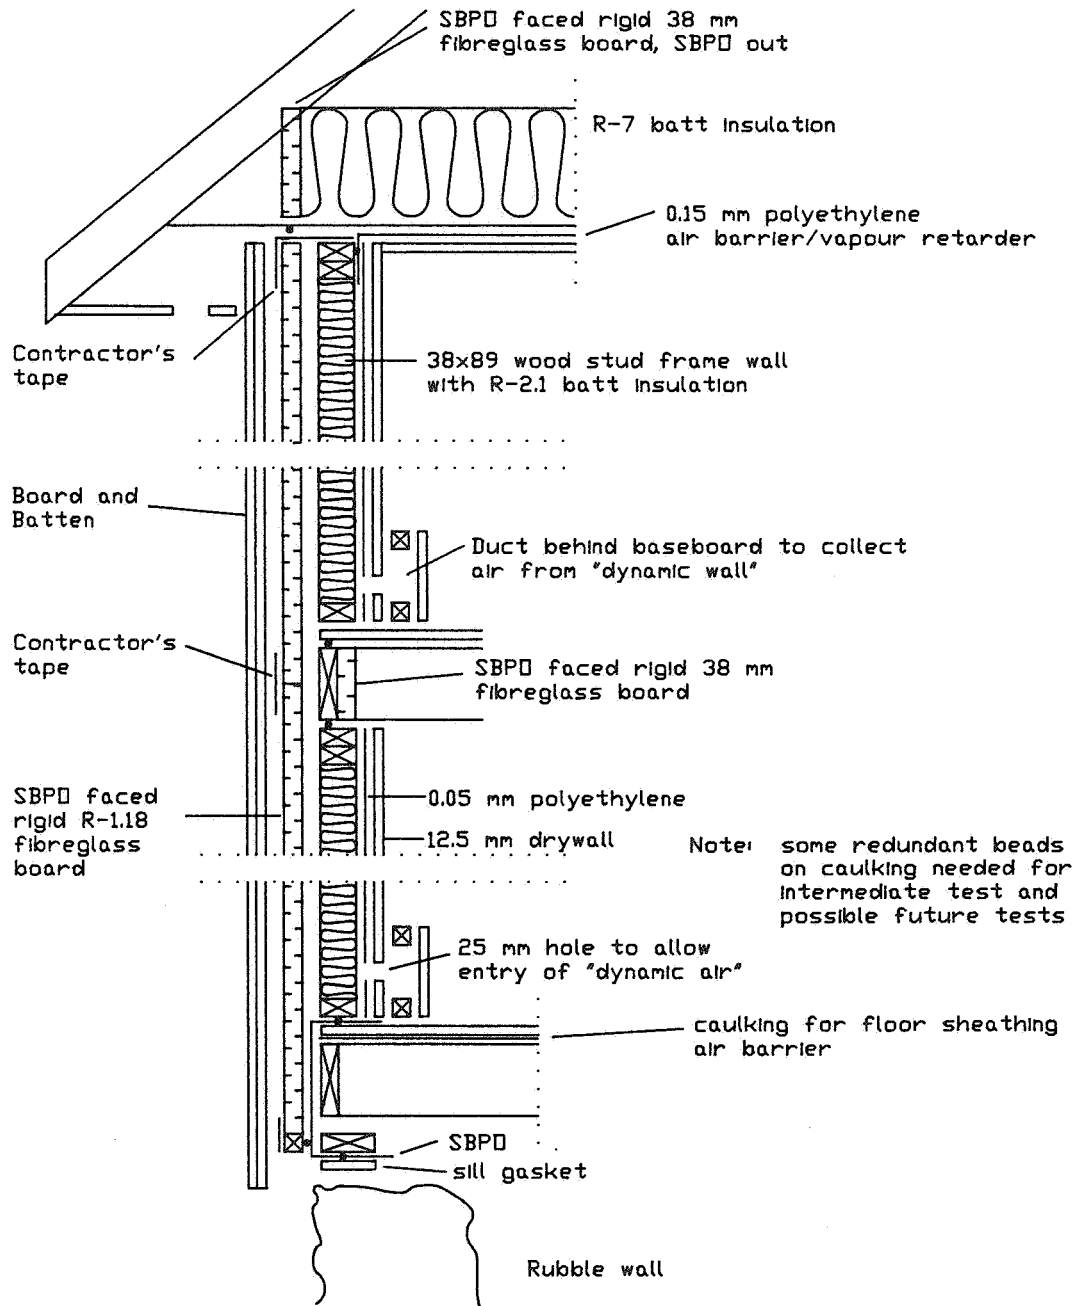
Expanded section through the thermal envelope of the dynamic wall house.
